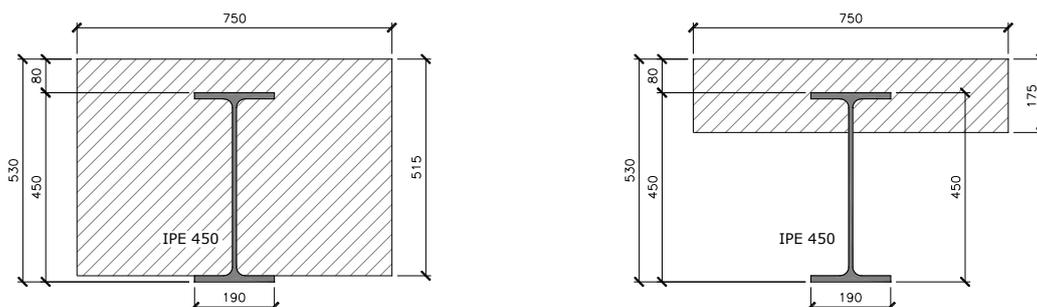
Cross-sections: original filler beam and modified partially encased beam
